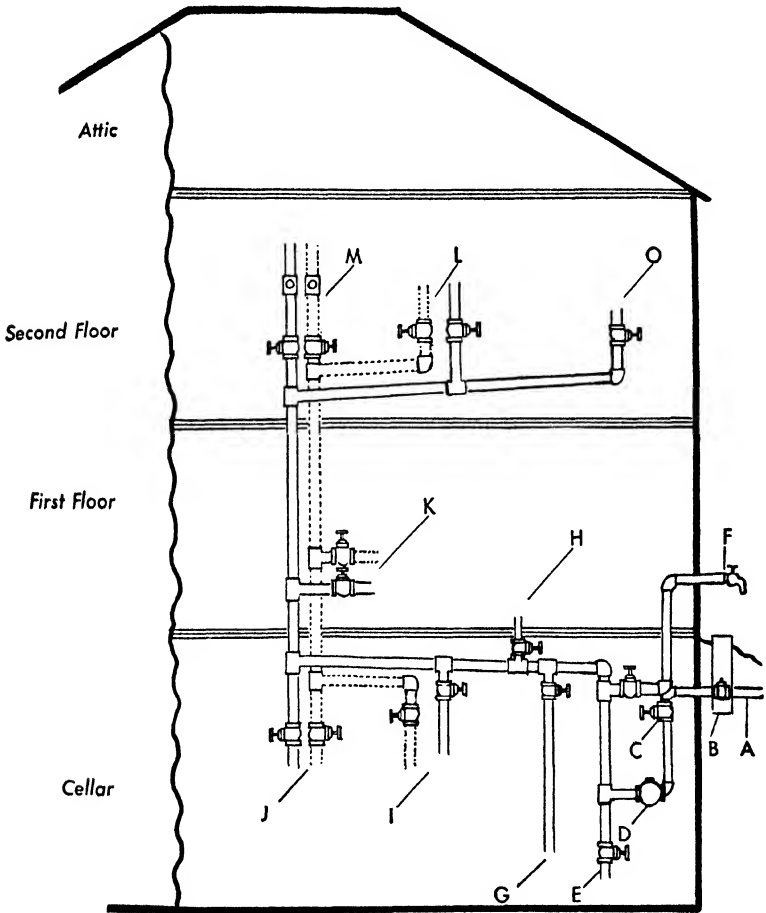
House Diagram Showing Arrangement of Water Pipes
